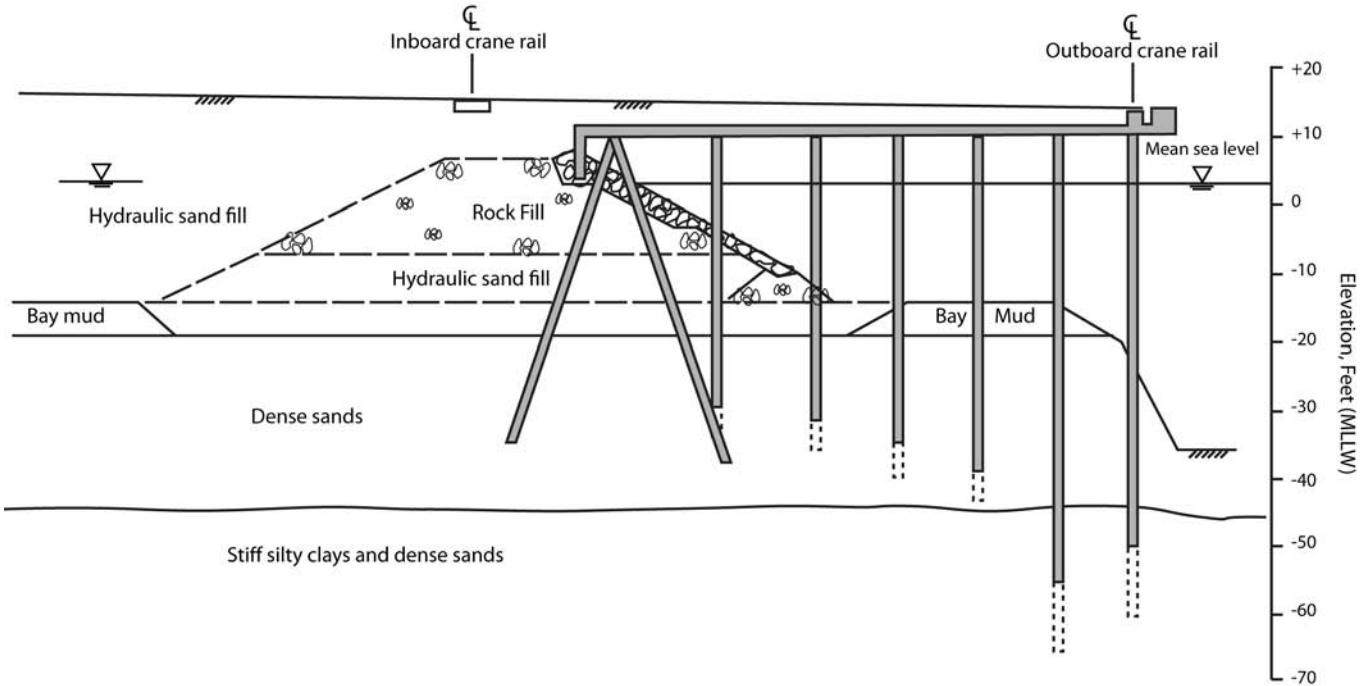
Cross-section schematic of 7th Street Terminal wharf, Port of Oakland, showing the foundation material and pile system (after Egan et al., 1992).
